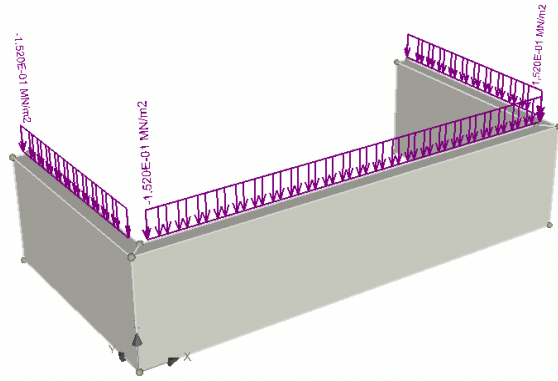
Axial gravity loading on the surface of the section of one floor
